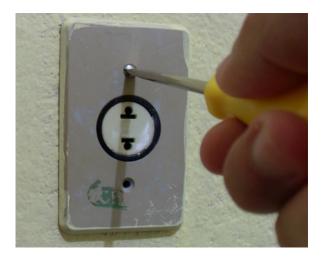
removing the cover plate (with a screwdriver) from a two-pin socket to change to a three-pin plug
